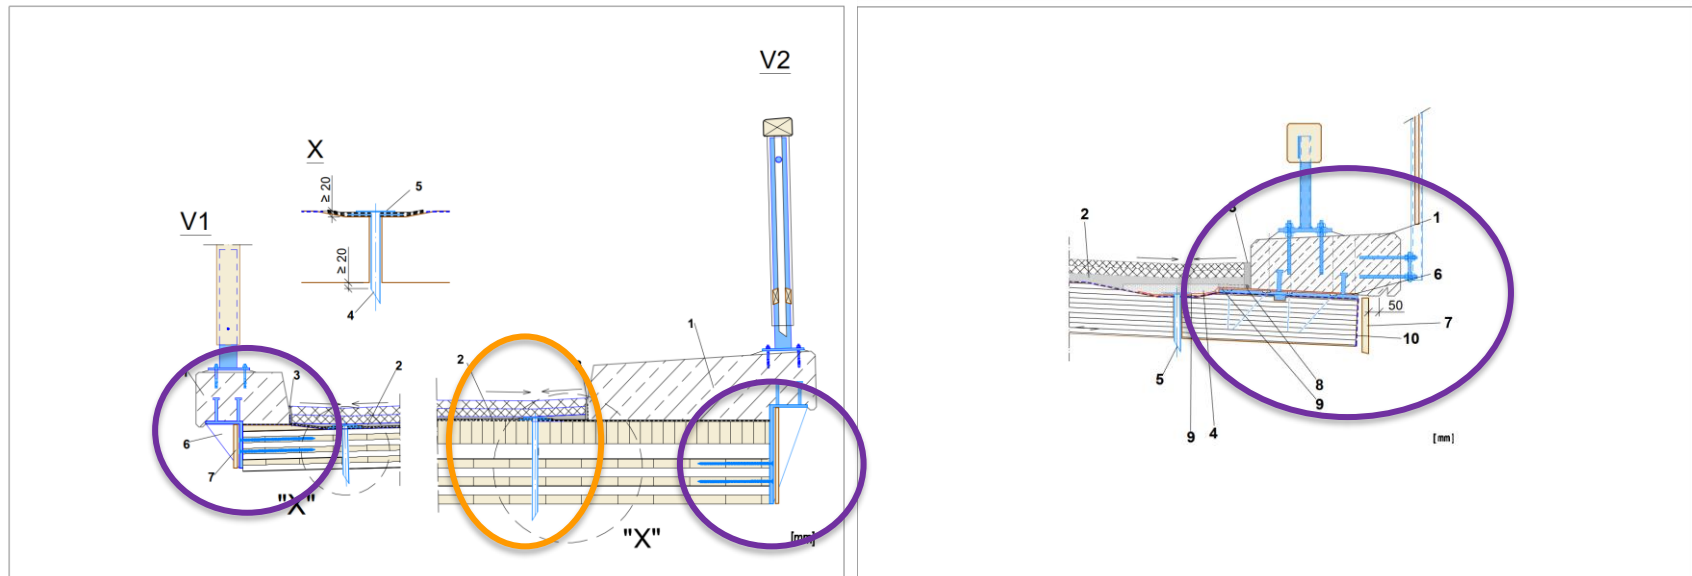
/ 5.10 – Detailing T-Kerb 1 / 2 – Durability: Edge sealing system on timber deck slab with concrete kerb - Solution 1 / Solution 2
